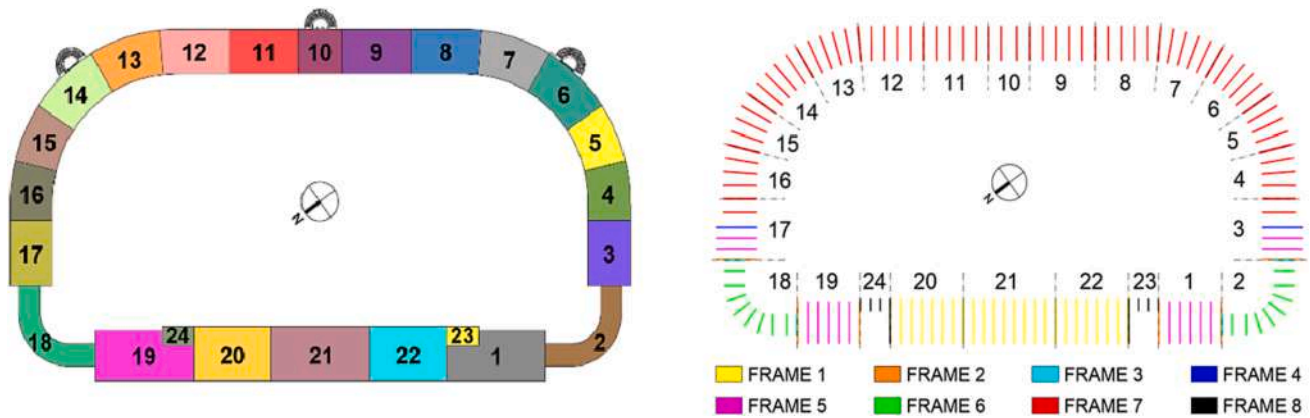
Blocks and RC frame types constituting the Stadium in plan.
